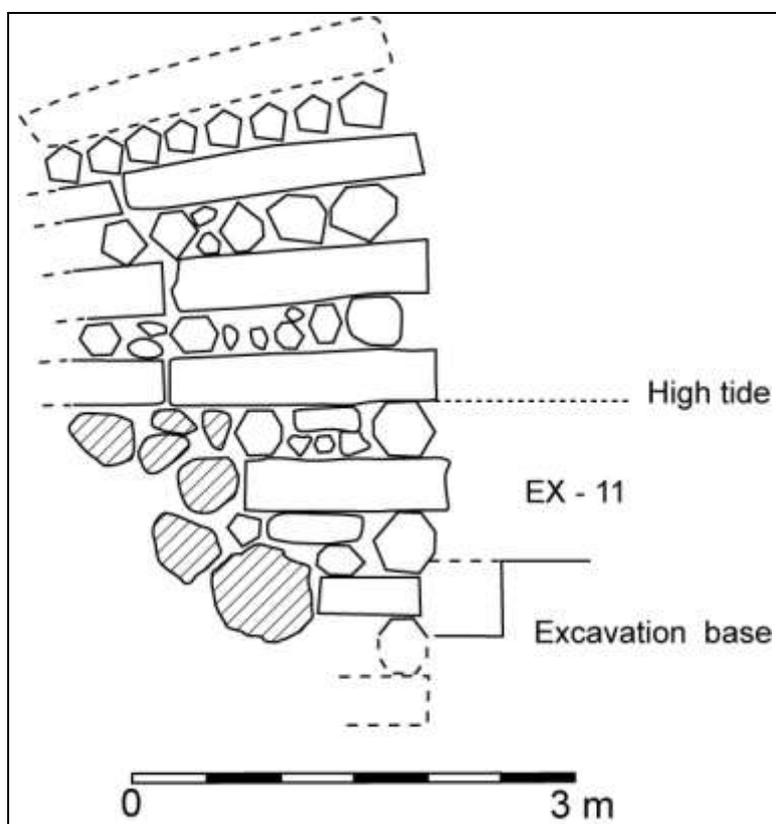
Schematic profile of excavation 11, showing the possible depth of the wall of platform 104 facing the main channel.
